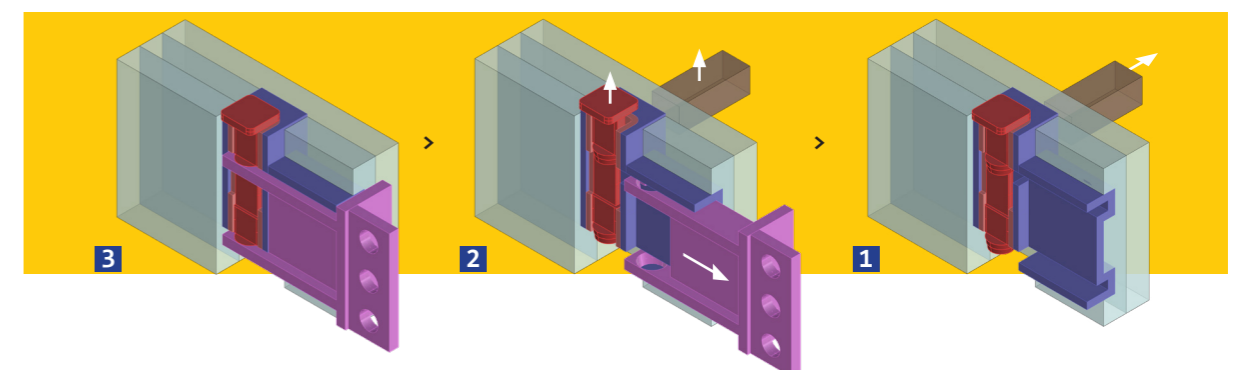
Sequence of assembly and disassembly of uni.conn | Source: Author
